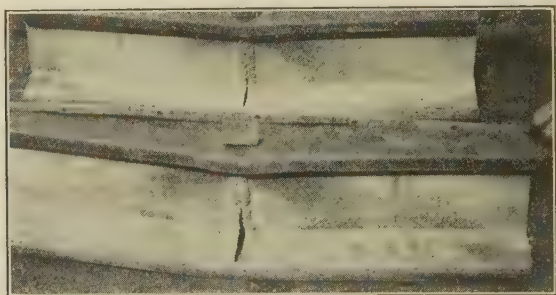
Test joints 28 and 29, 7-in. rail 1- x 7- x 36-in. base plate. No. 28, yield point load 303,000 lb. No. 29, yield point load 312,000 lb. Heads crushed $\frac{1}{4}$ in. at maximum load of 358,000 lb. and 362,500 lb., respectively.
